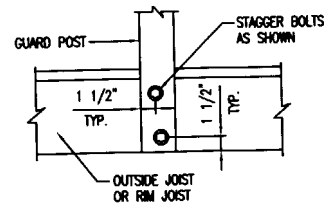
GUARD POST ATTACHMENT DETAIL
